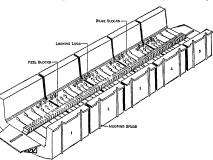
TIMBER SECTIONAL DRY DOCK
